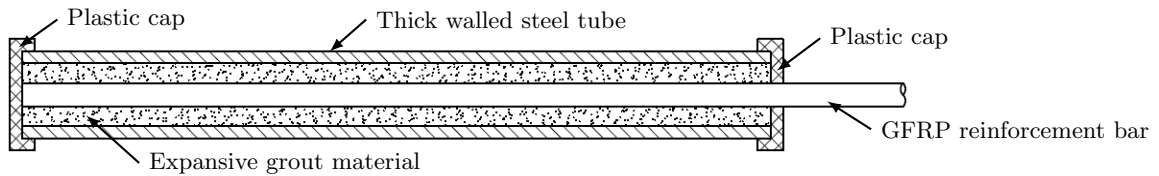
Schematic drawing of tensile test anchor according to ASTM D 7205-06
